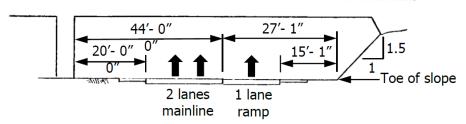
Bridge elevation view of horizontal clearances for highway feature carrying mainline and ramp traffic below the bridge.
